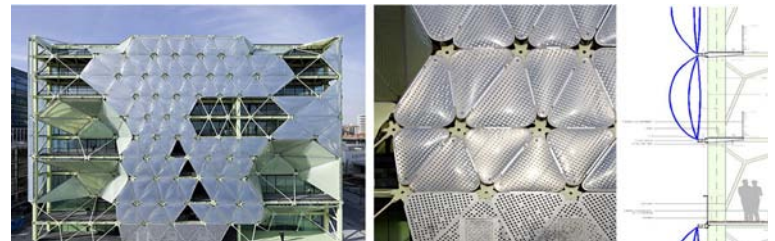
Media-Tic Building Facade, photo by Iwan Baan..
